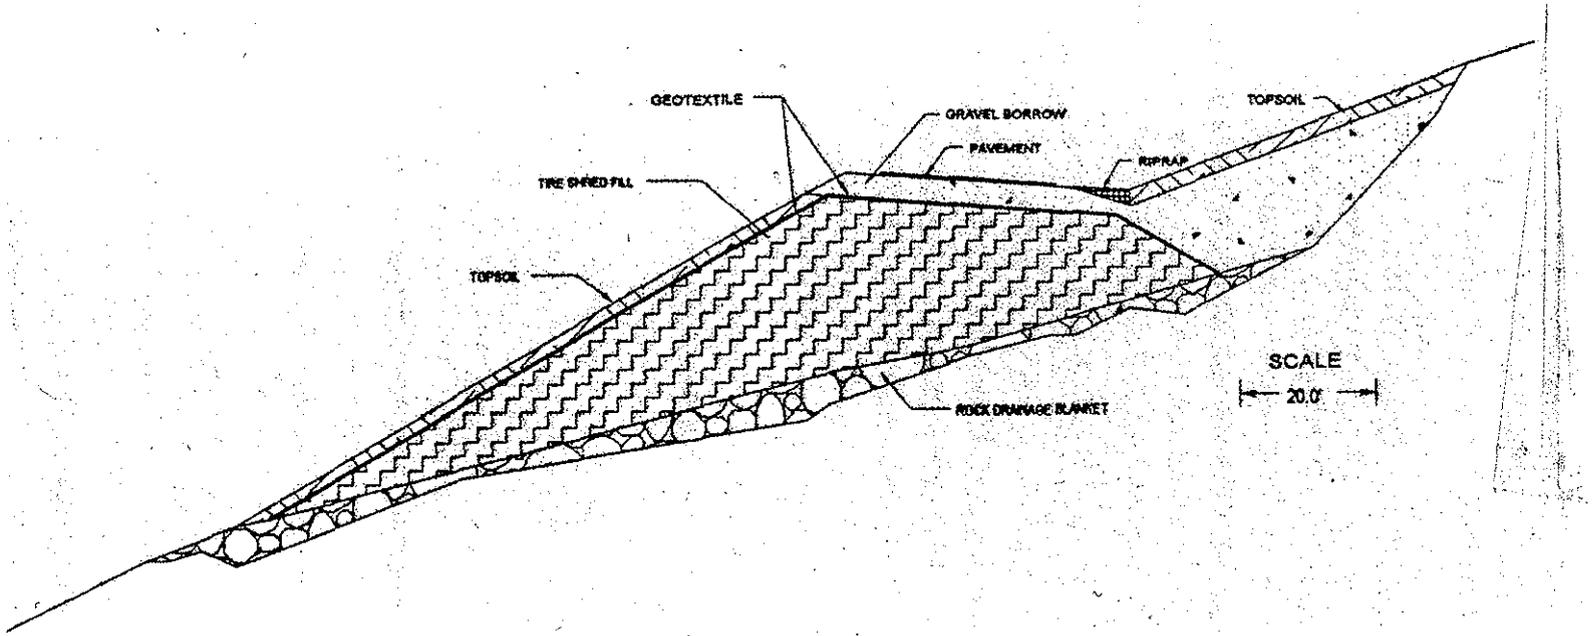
Cross section through tire shred fill on SR 100 in Ilwaco, Washington (Humphrey, 1996).
